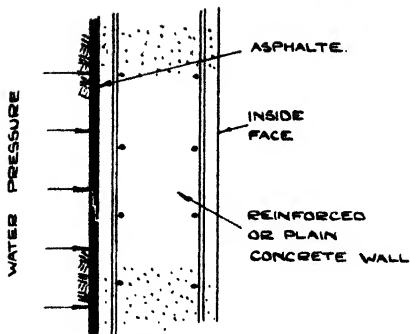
ASPHALTE LAID DIRECTLY ON TO EXTERNAL FACE OF CONCRETE WALL
